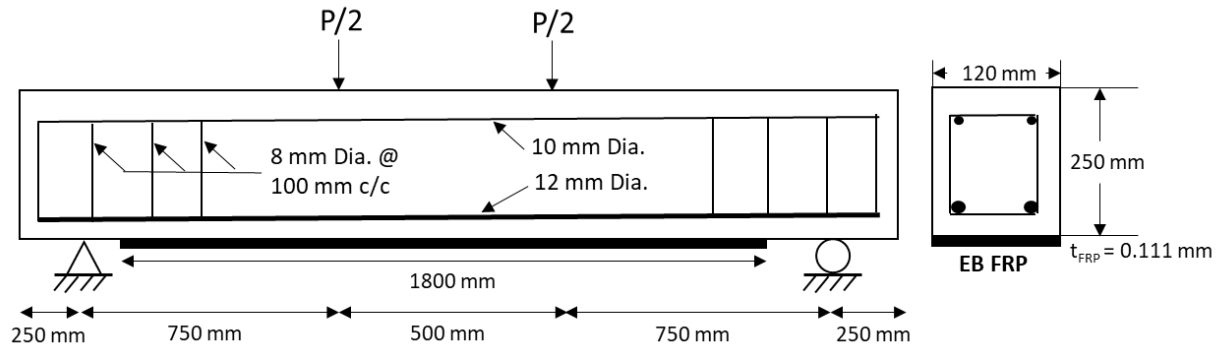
Overview of strengthened Beam A20 (Zhang et al., 2006)
